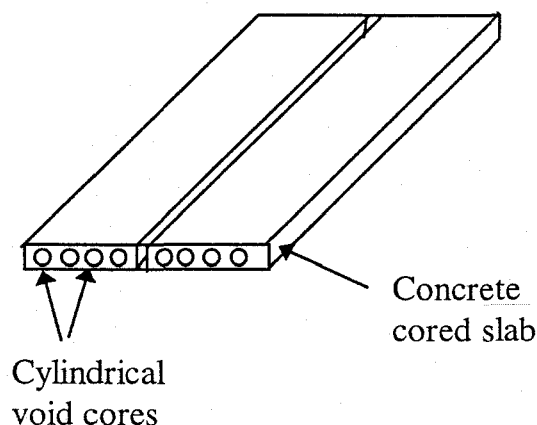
Concrete cored slab (based on Bahadori, 1981).
